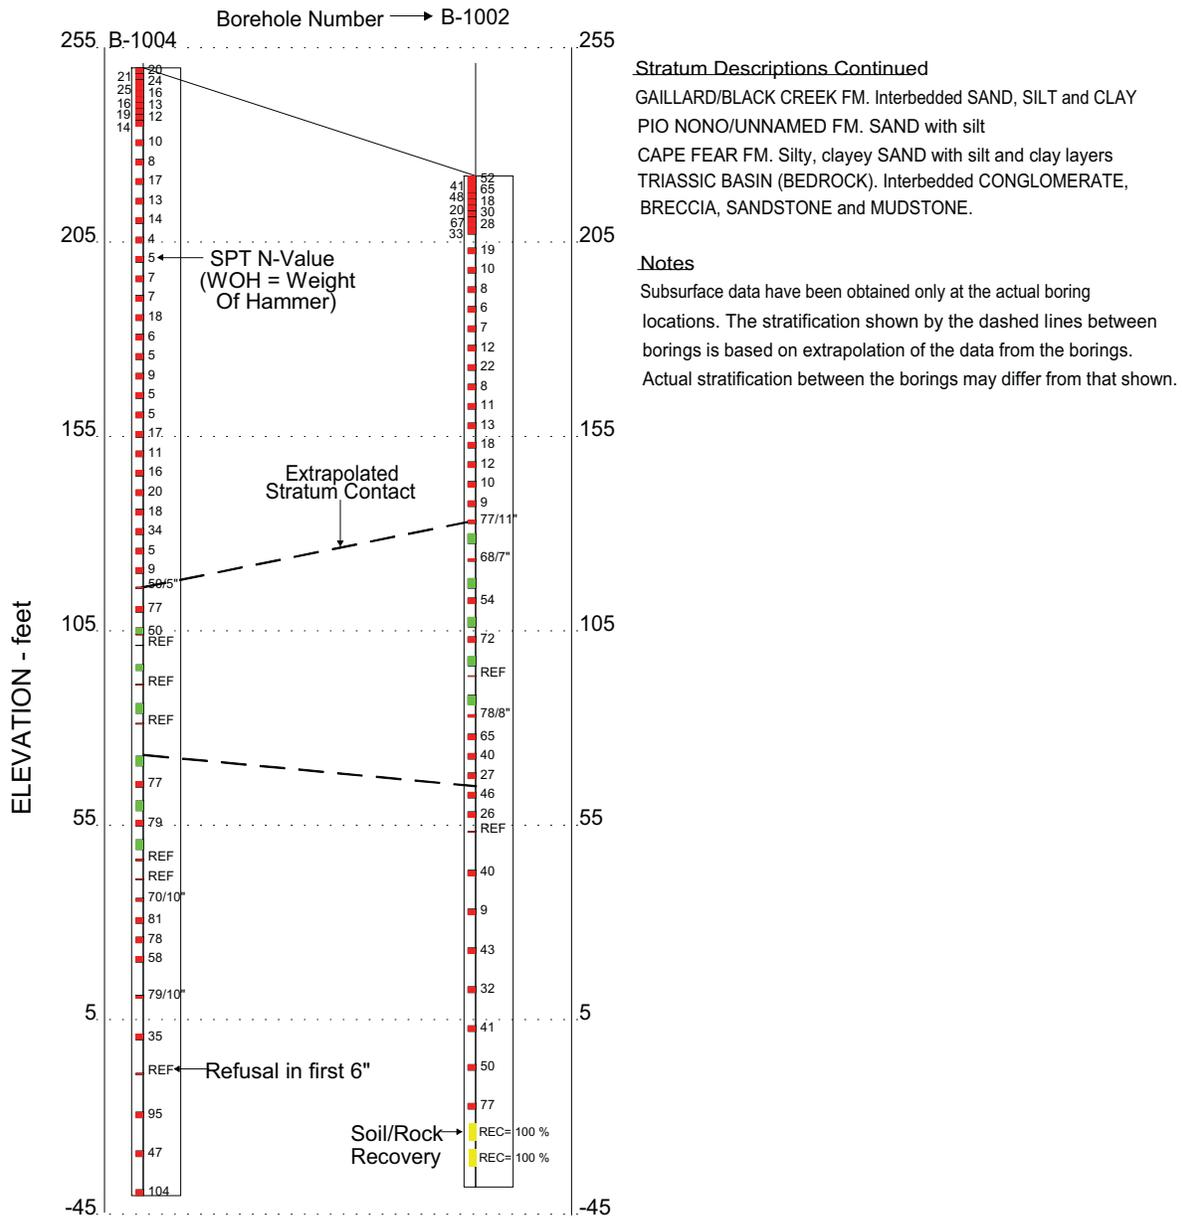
COL Power Block — Cooling Tower Boring Location
